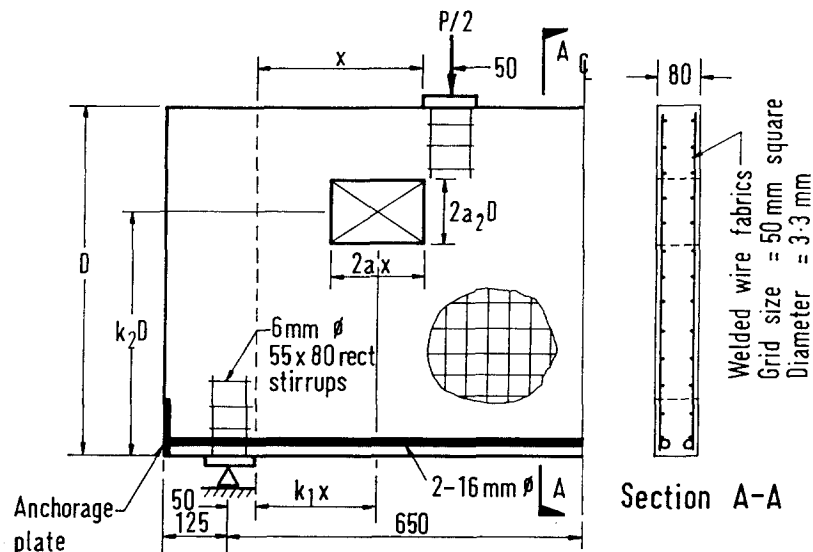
Details of geometry and web reinforcement for beams of B-series.
